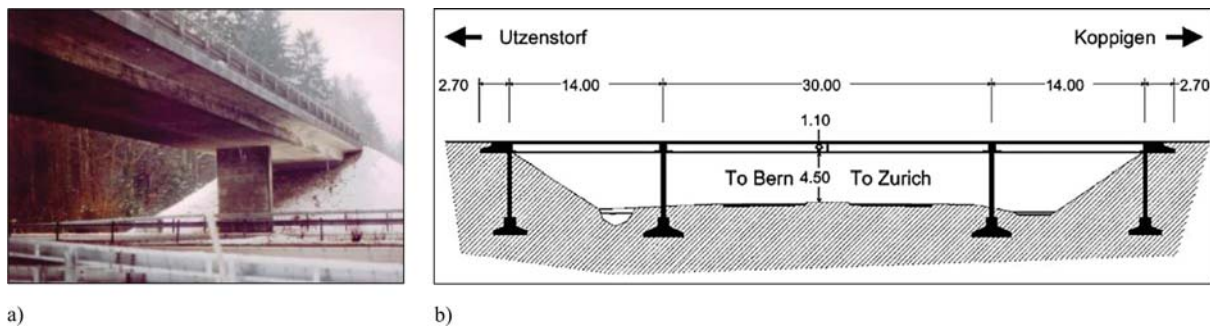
Z24 bridge: a) general view [13], b) longitudinal section [14].
